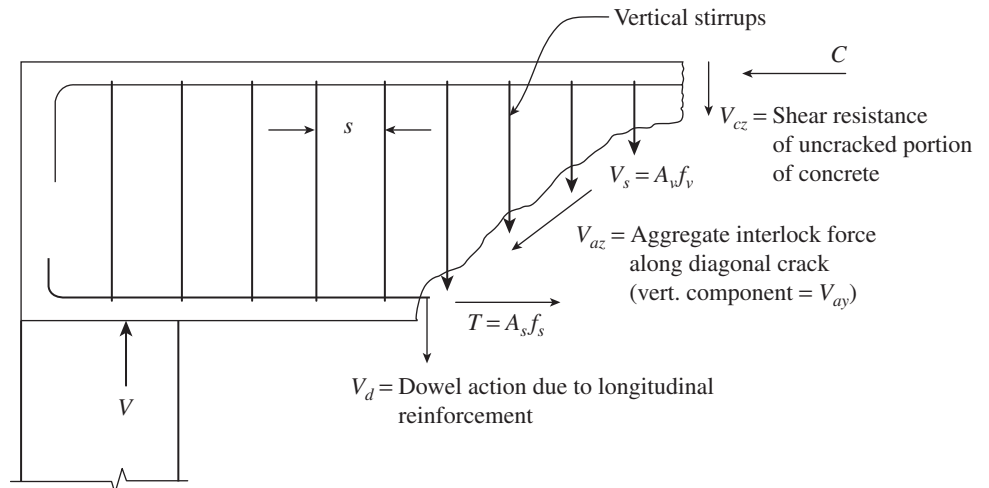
Equilibrium of internal forces in a cracked beam with stirrups
